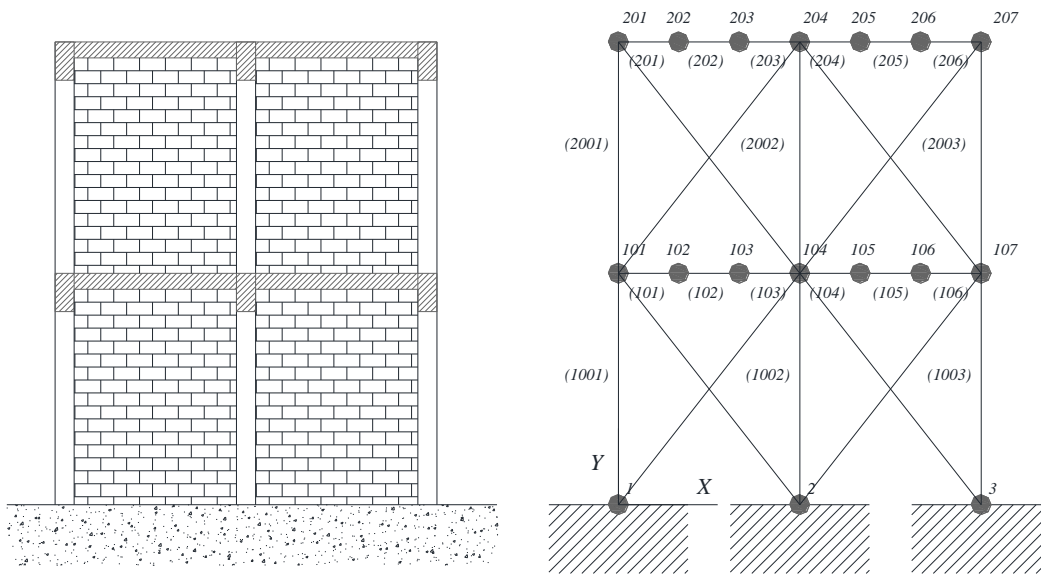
Geometry of structural models for either bare and masonry infilled RC structure under consideration
